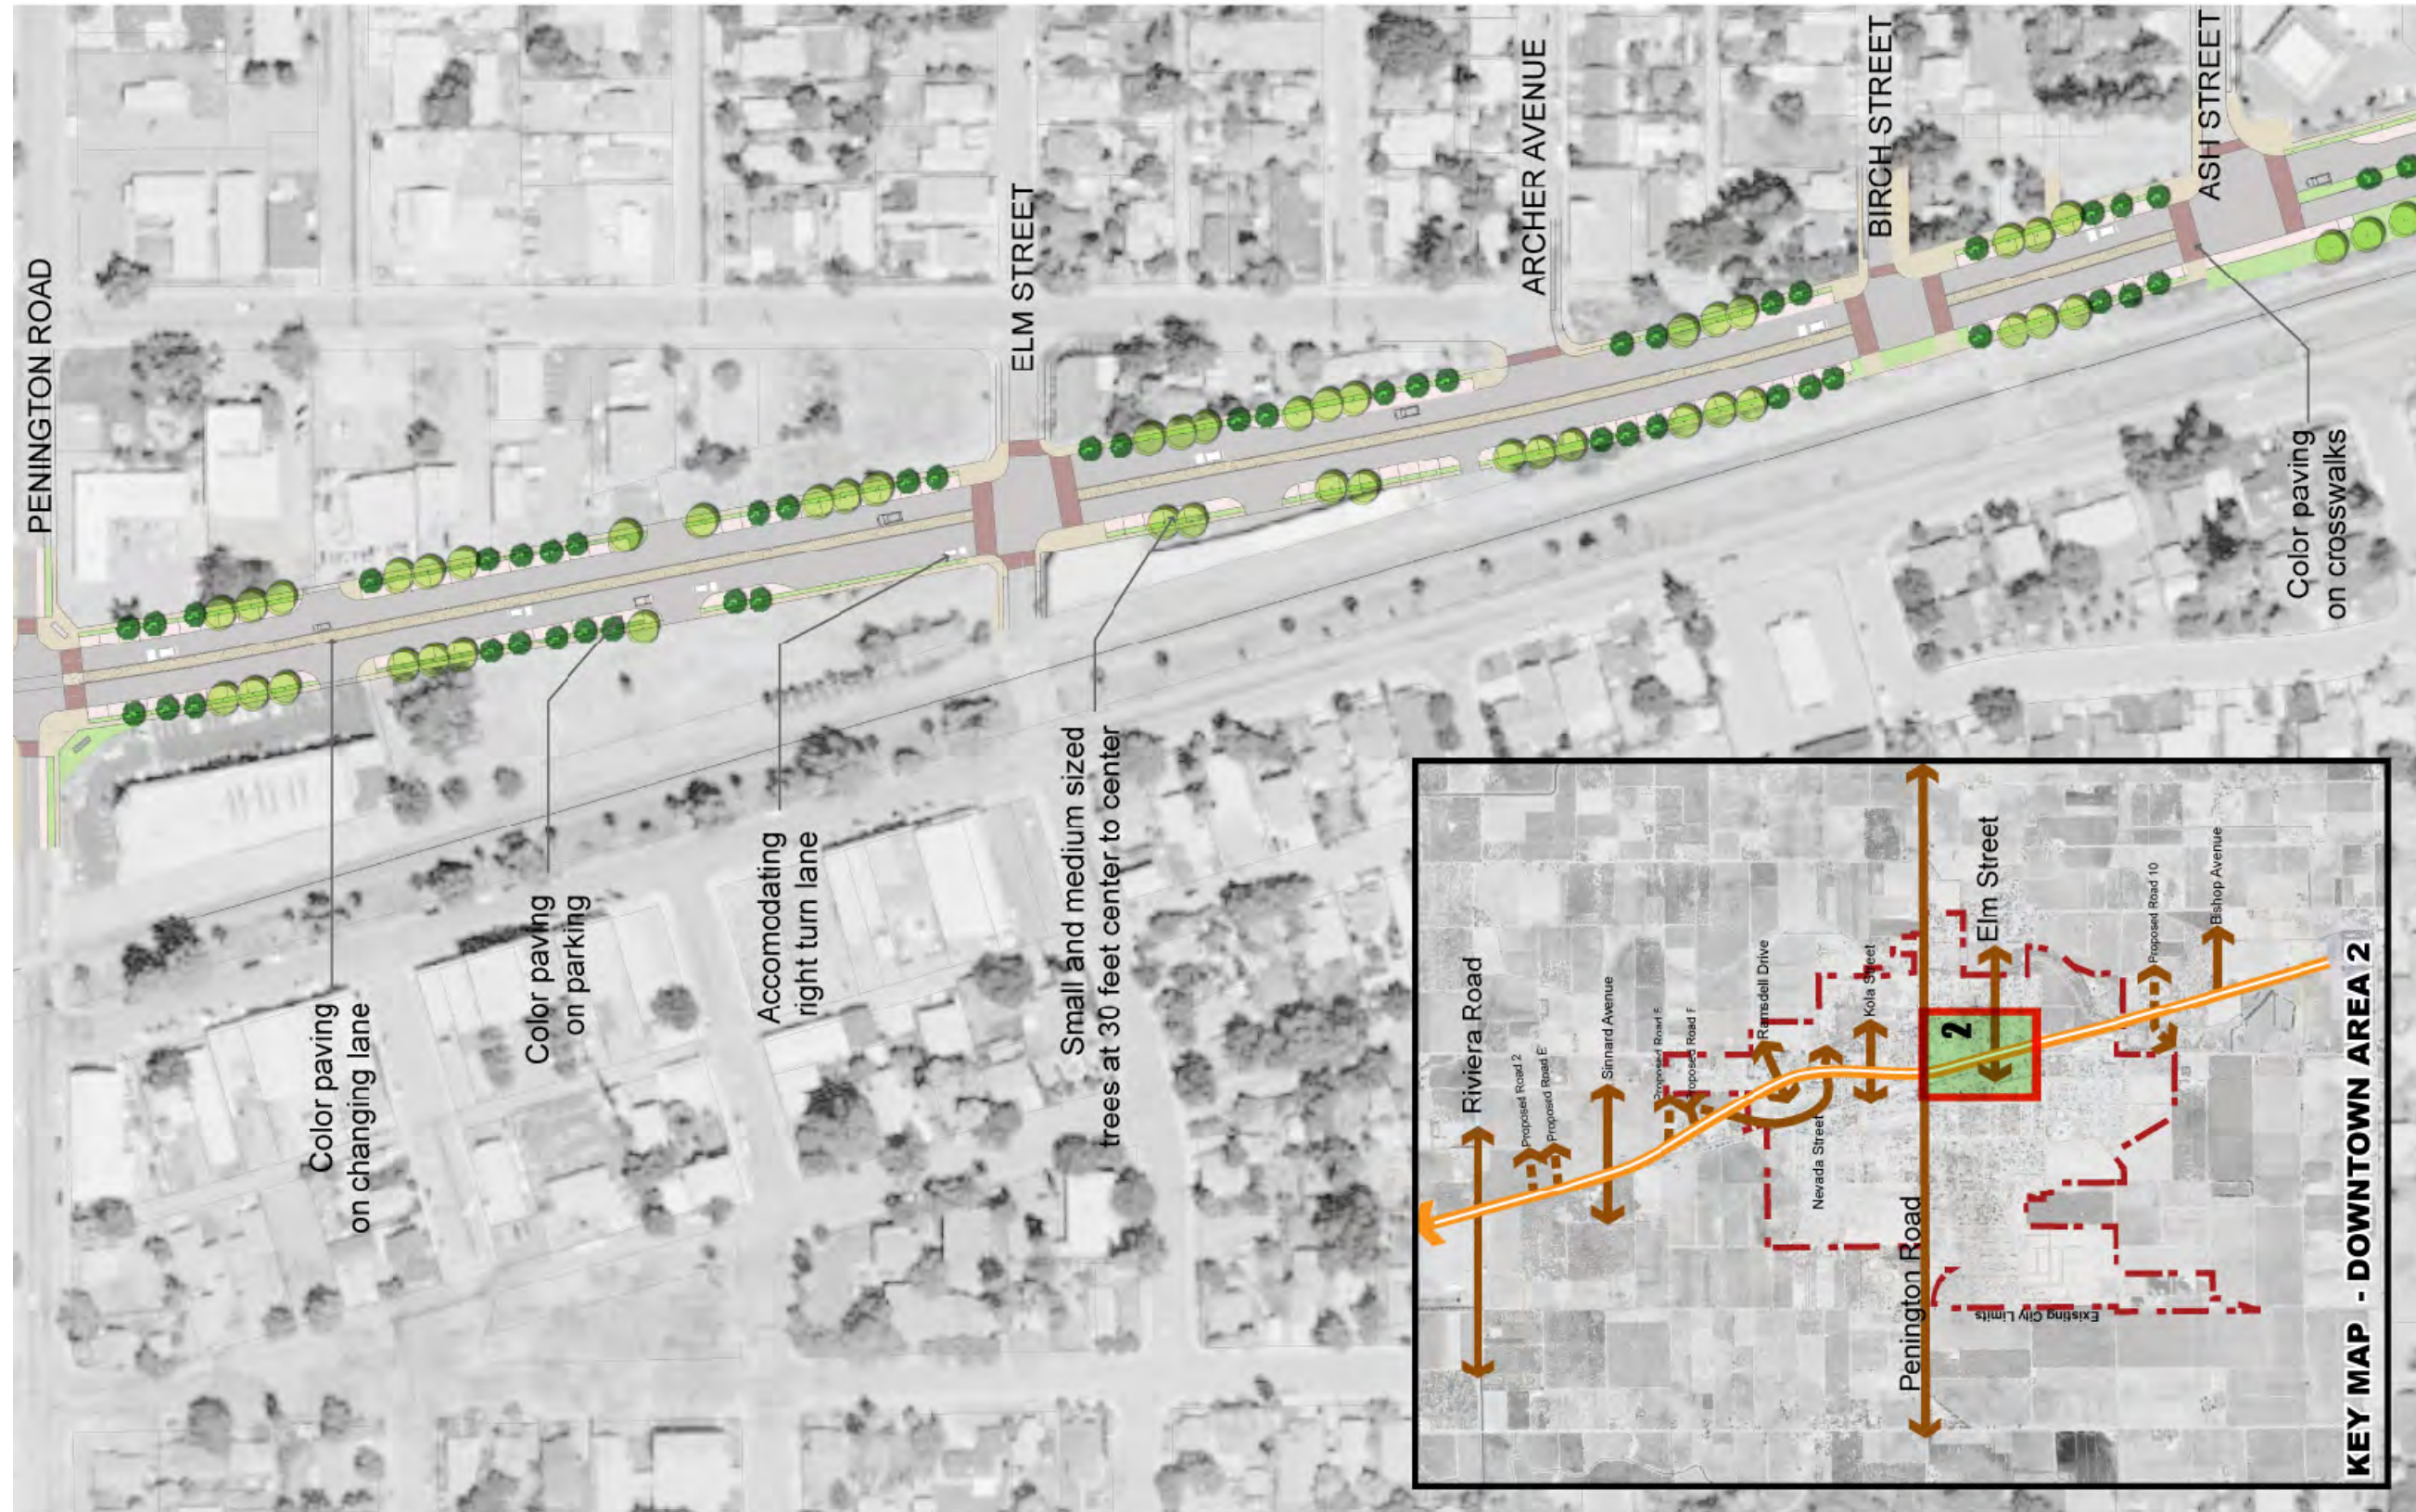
Conceptual Layout between Pennington Road and Nevada Street
